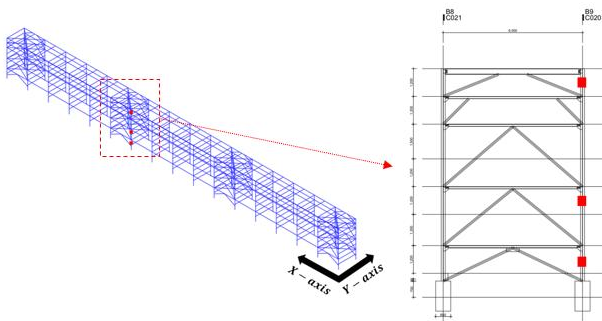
Installation Location Diagram of Pipe-rack Sensors
